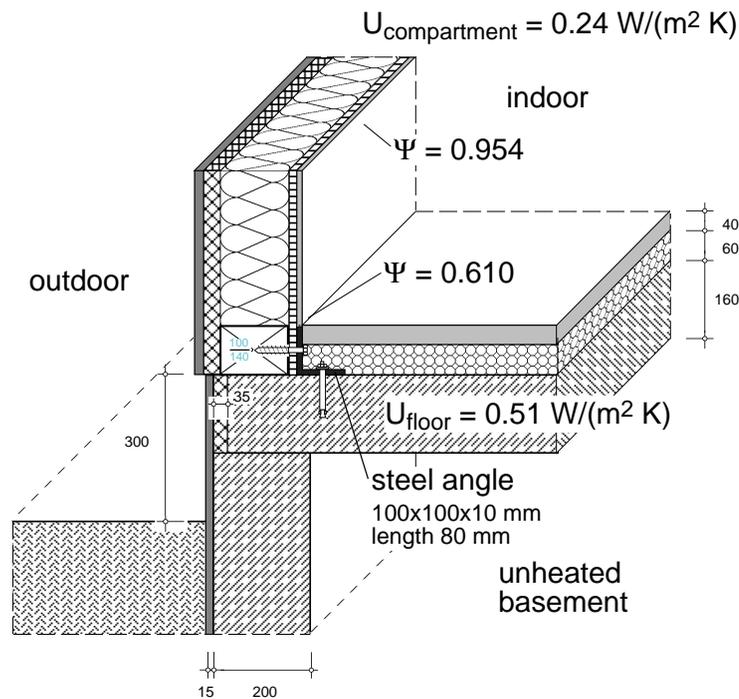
Example of heat bridge in typical joint between timber frame wall and concrete floor.
